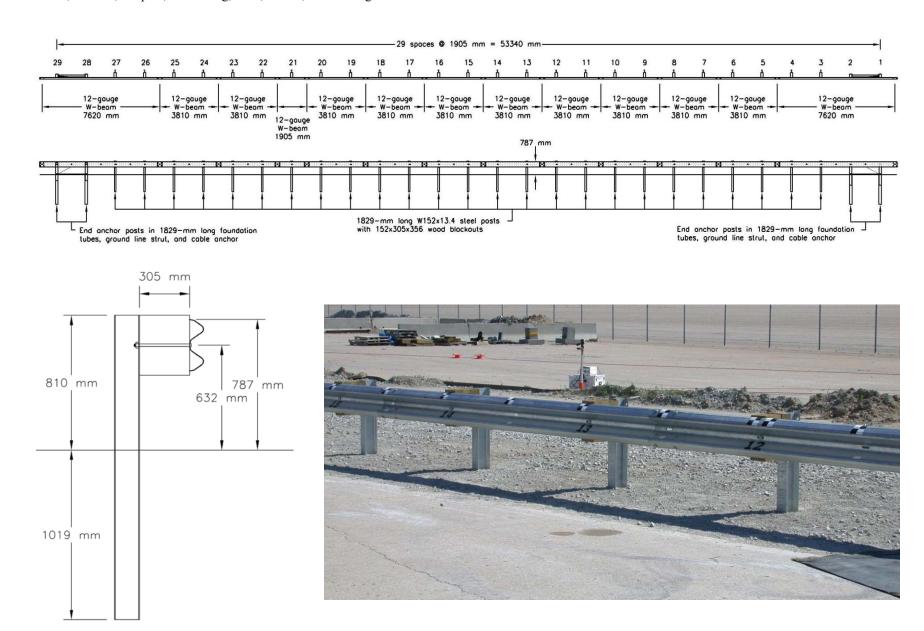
Midwest Guardrail System - Standard Post Spacing Design Details (Design A) [1 in. = 25.4 mm].
